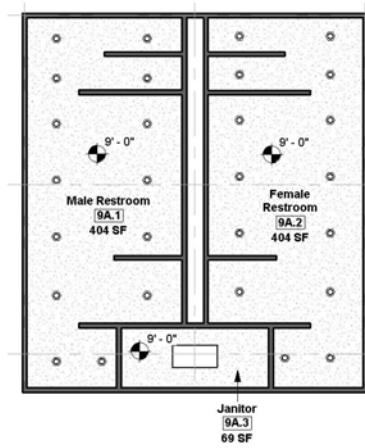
Module 9A: Back of House Restrooms – Reflected Ceiling Plan
